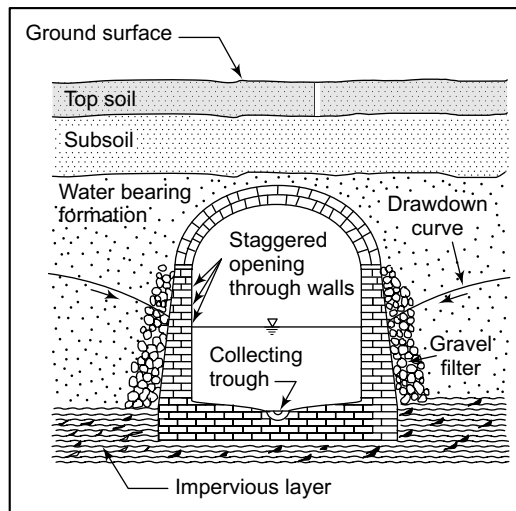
Sectional view of brick-masonry lined infiltration gallery
